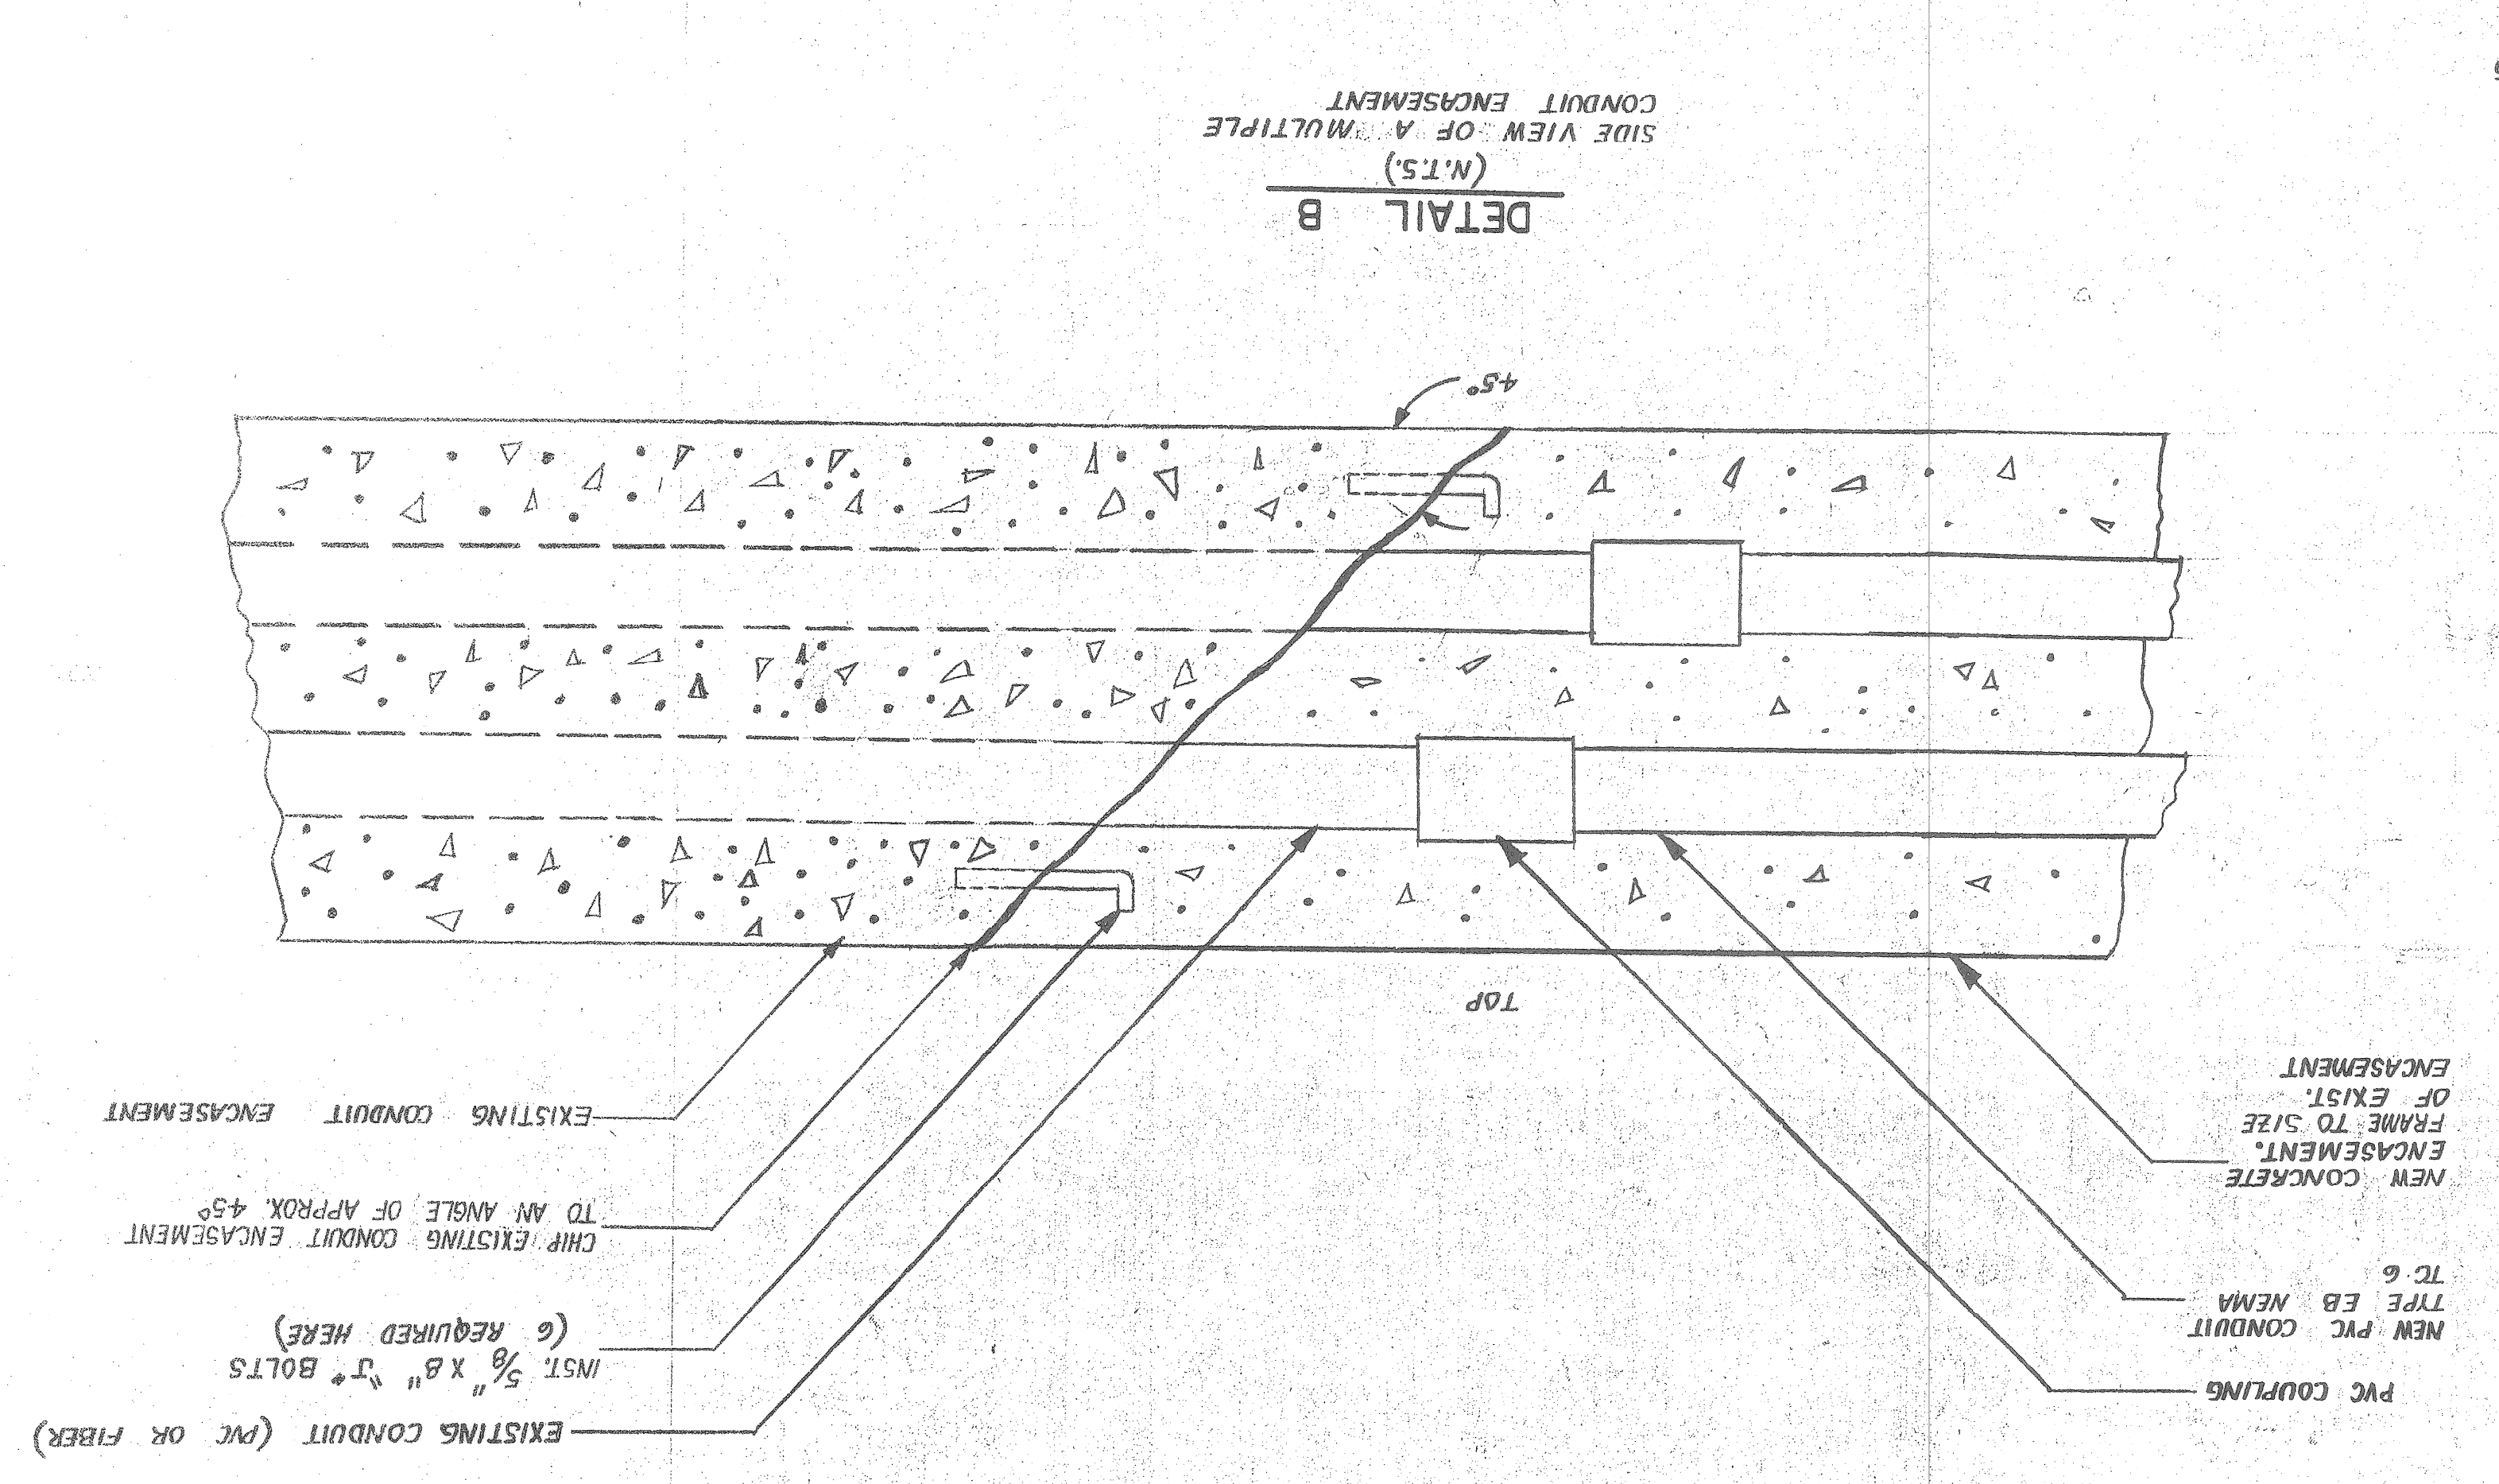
DETAIL FOR JOINING CONDUIT ENCASEMENTS
